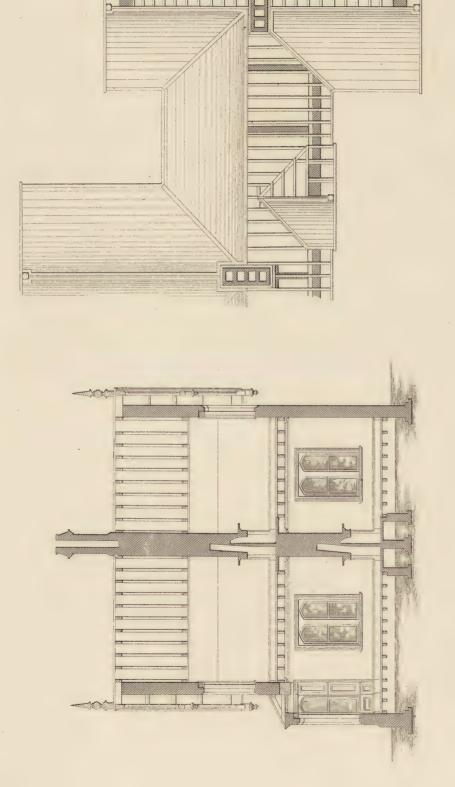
PLATES  $\frac{M}{3} - \frac{M}{4}$  contain Section and Roof Plan. The Section is cut on the line A—B shewn on the plans. The Roof is drawn indicating one half slated and the other in naked timbers.
